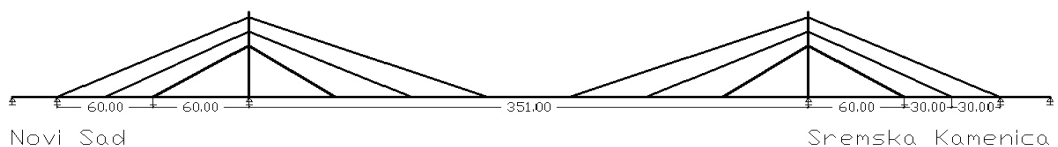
Longitudinal section of the bridge with stabilization disposition.
